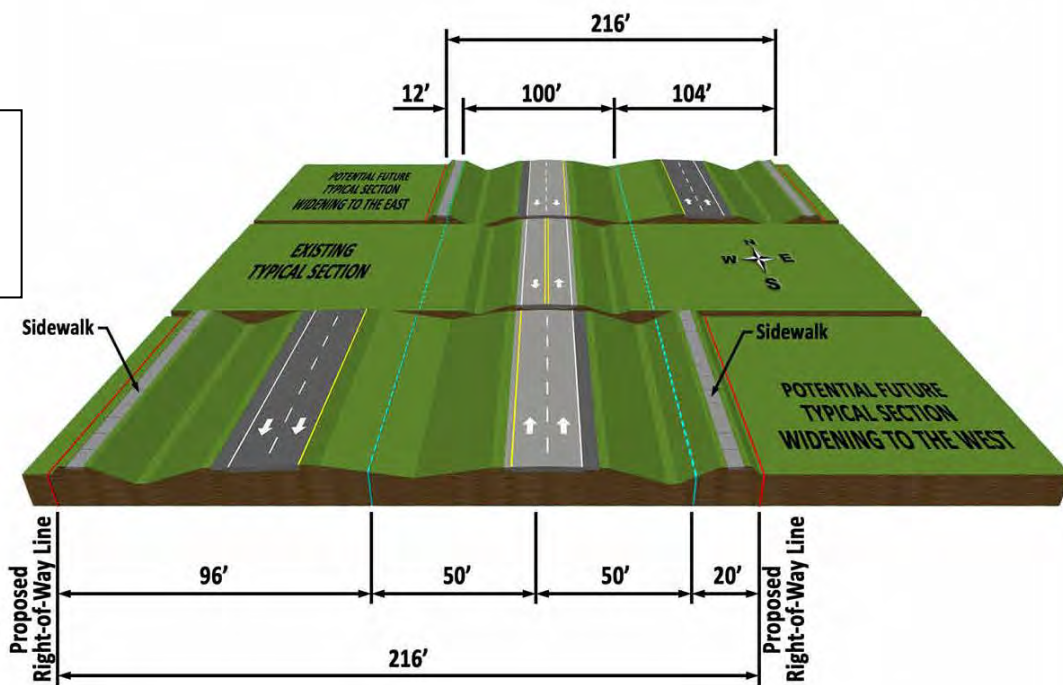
Preliminary Four-Lane Divided Typical Sections
